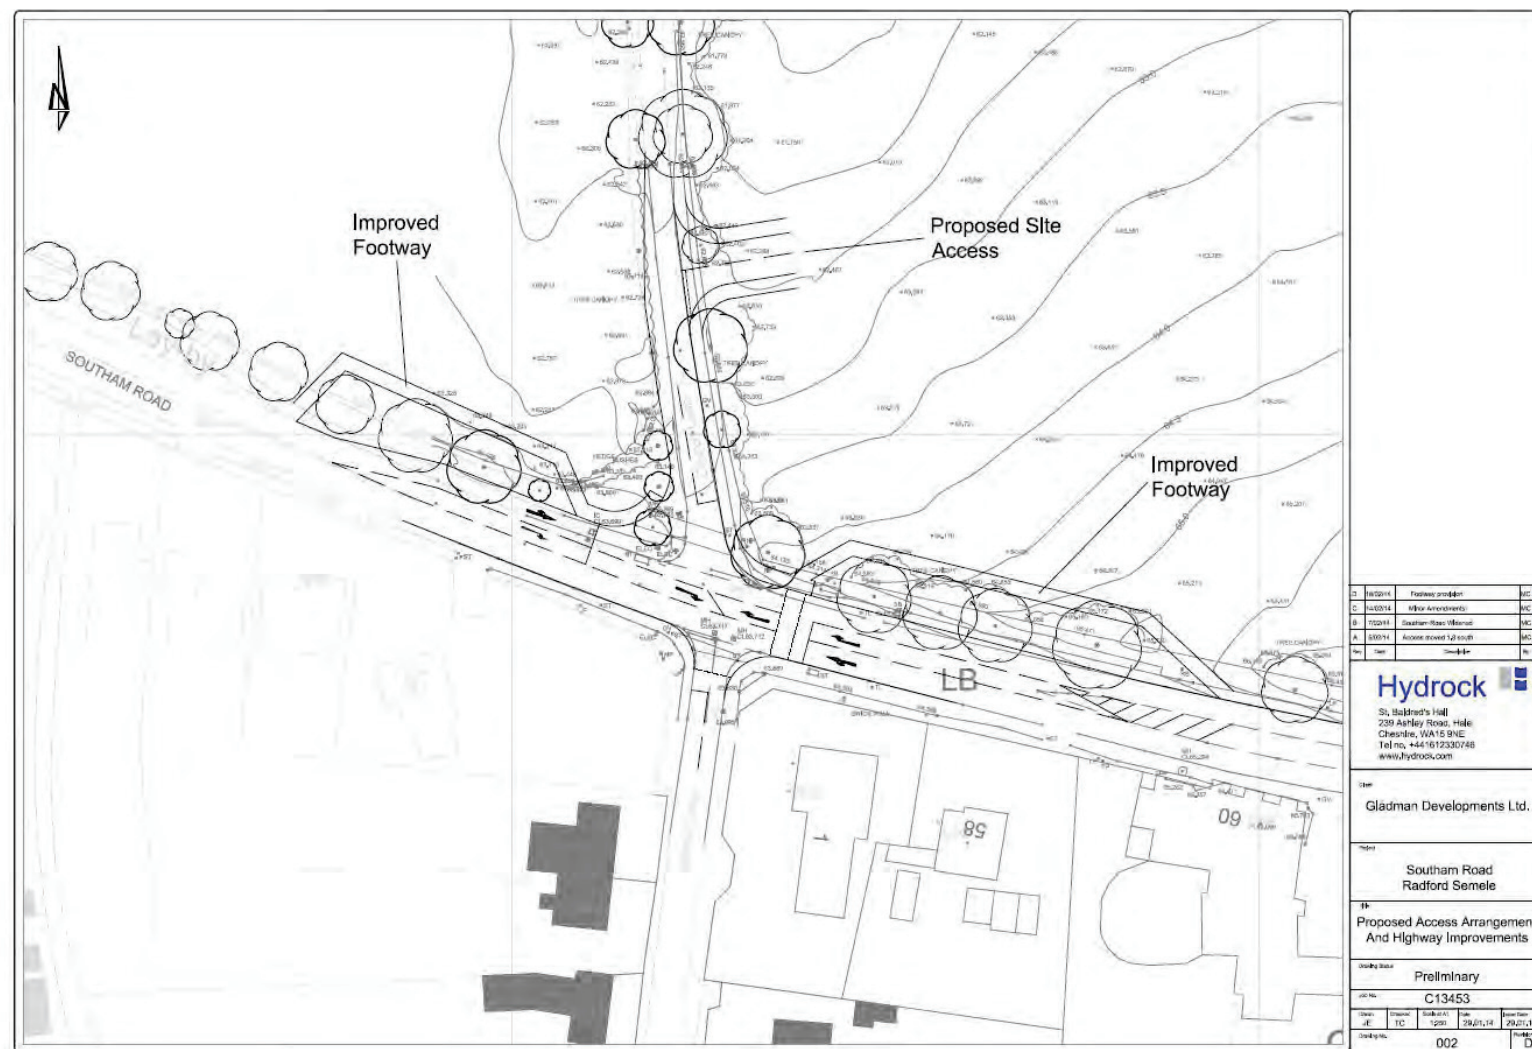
Proposed Access Arrangement and Highway Improvements Plan. Note: Drawing not to scale (Source: Hydrock Group Ltd, dated 29 January 2014).
